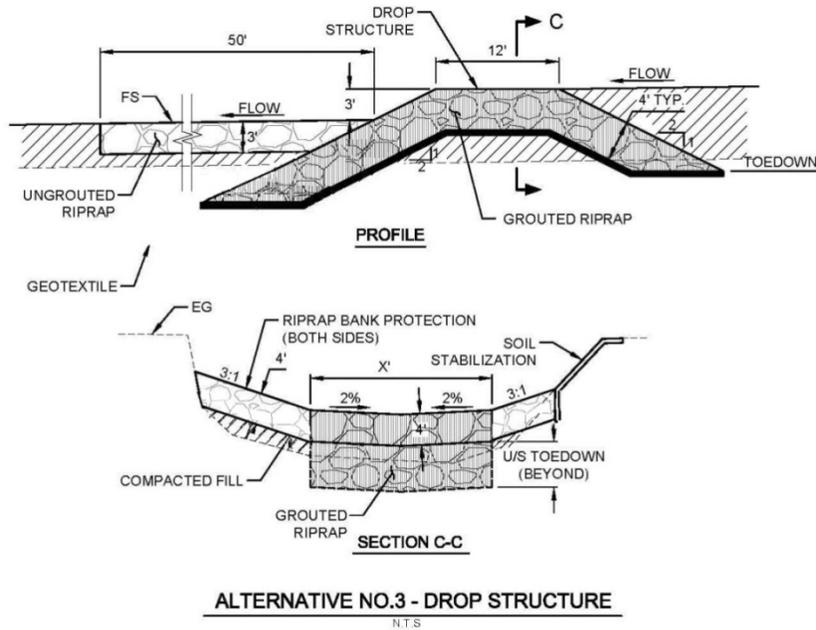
Typical Section of Drop Structures (Alternative 3)
